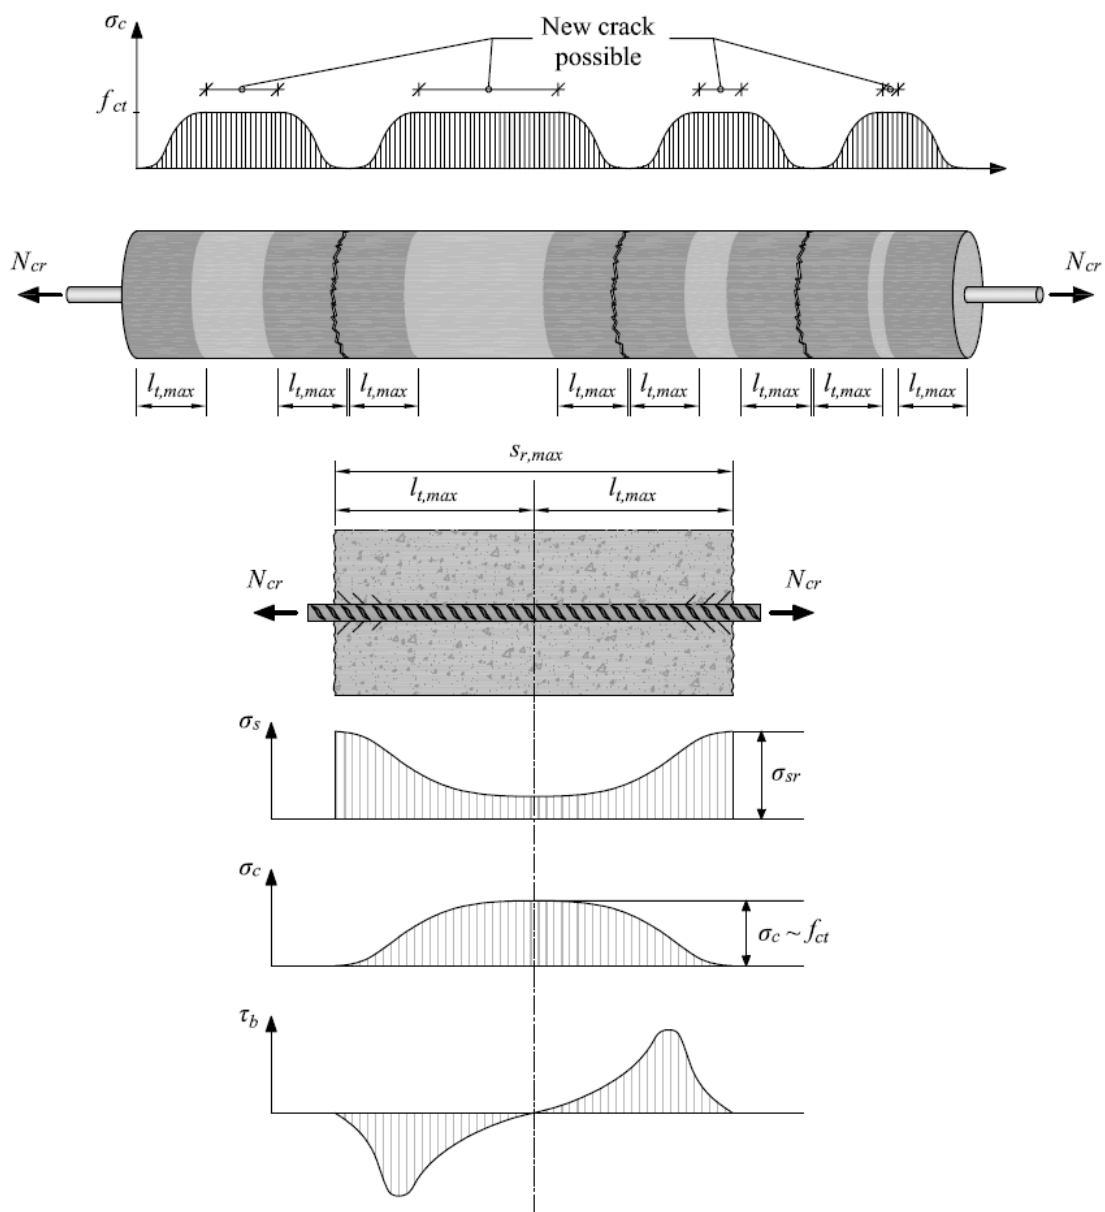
Prismatic concrete specimen with a single centric reinforcement bar subjected to uniaxial tension and the distribution of normal tensile stresses in the steel and concrete as well as bond stresses along a segment between two consecutive cracks of length equal to the maximum crack separation.
